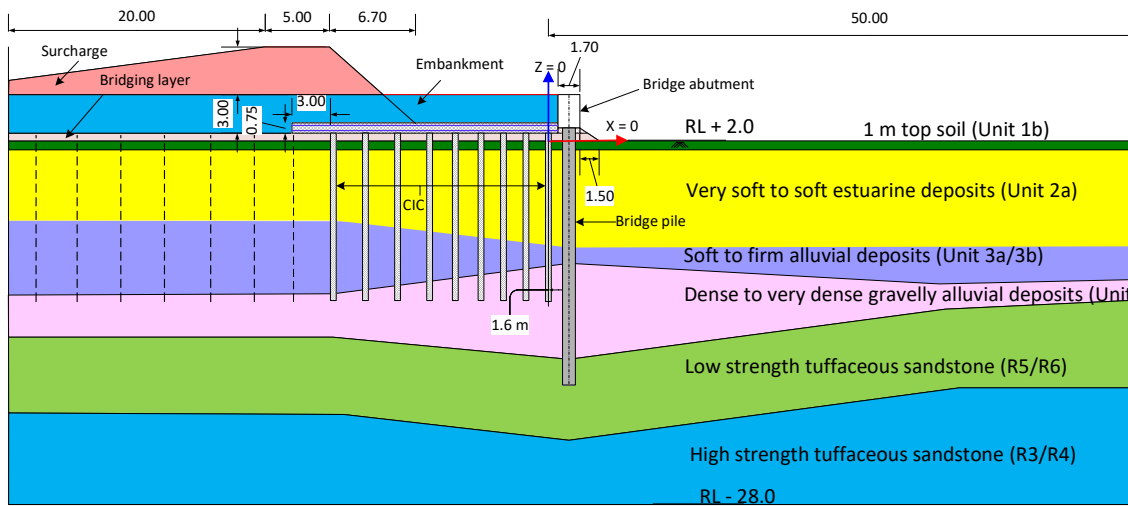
Schematic diagram of the section adopted for finite element modelling (all dimensions are in metre and not necessarily to scale).
